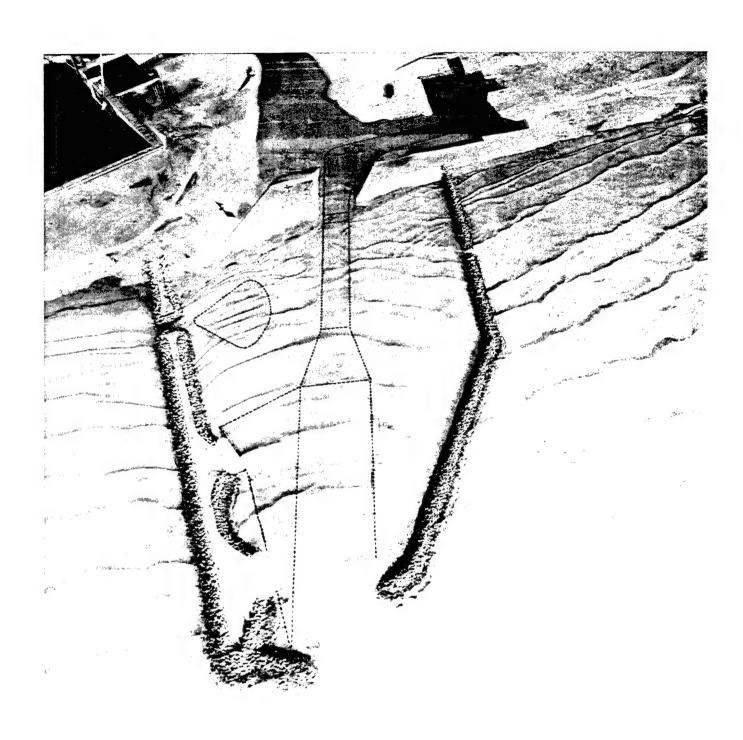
Typical wave patterns for Plan 19; 12-sec, 5-m (16.4-ft) waves from 182 deg; swl = +0.5-m (+1.6-ft)
